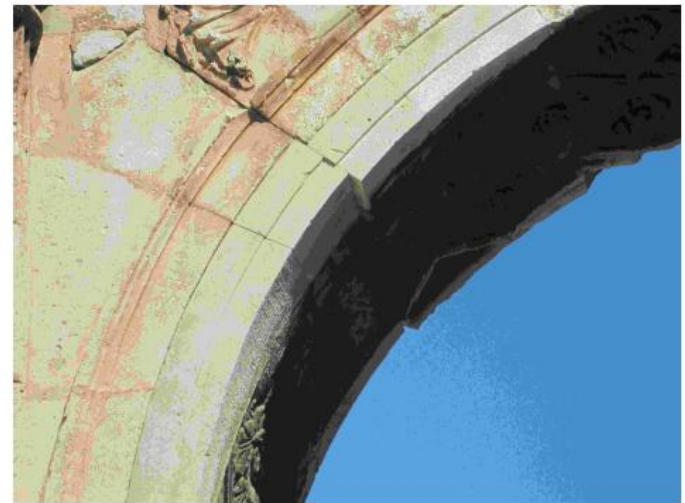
Porta Aurea, western façade, dropped ashlar in the arch.
